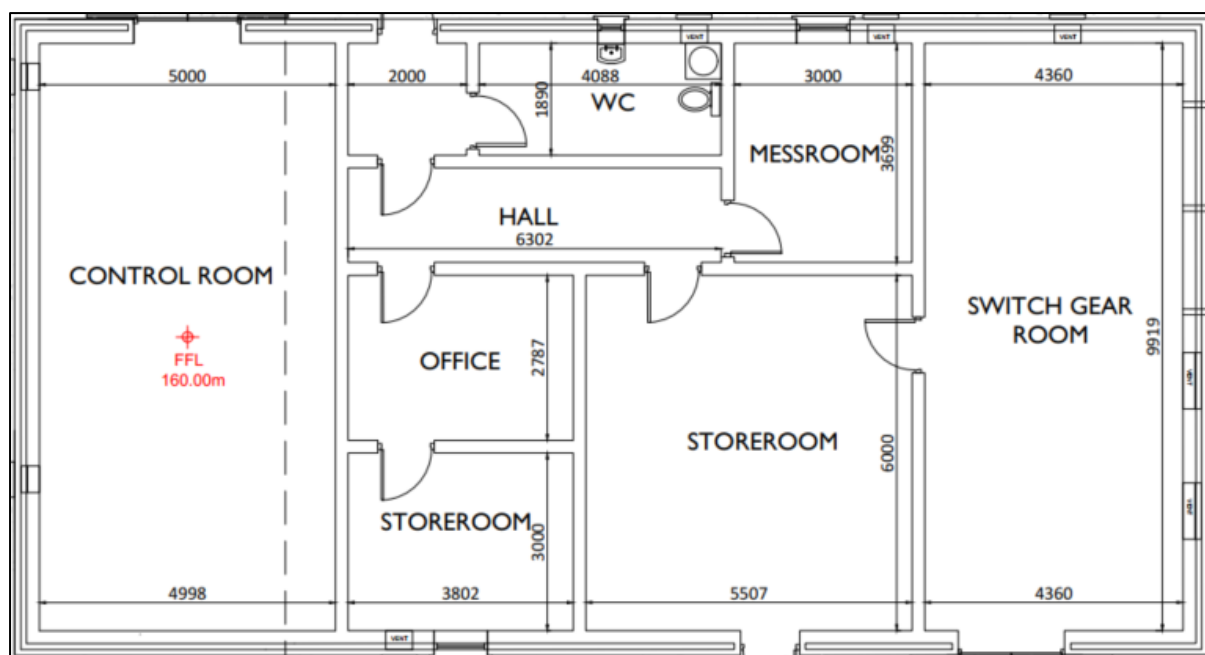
Proposed EirGrid Building forming part of On-Site Substation
